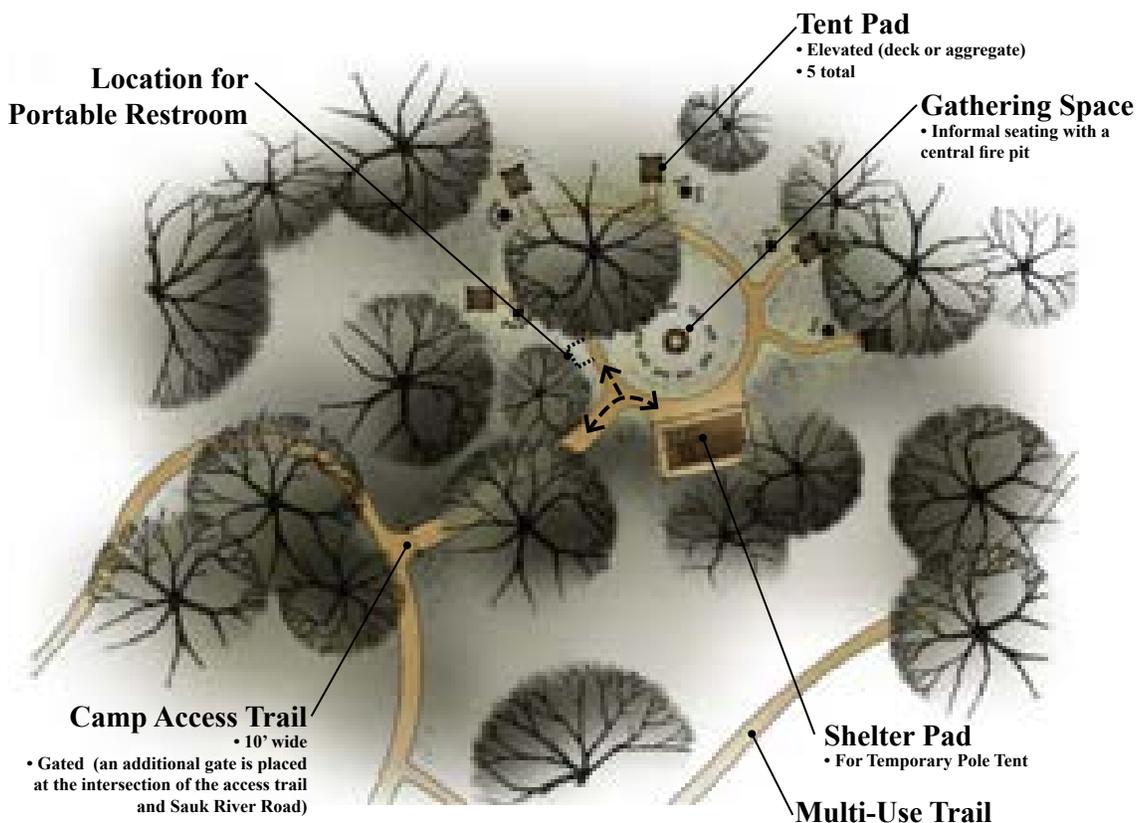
LAYOUT ENLARGEMENT PLAN OF THE GROUP CAMP AREA
